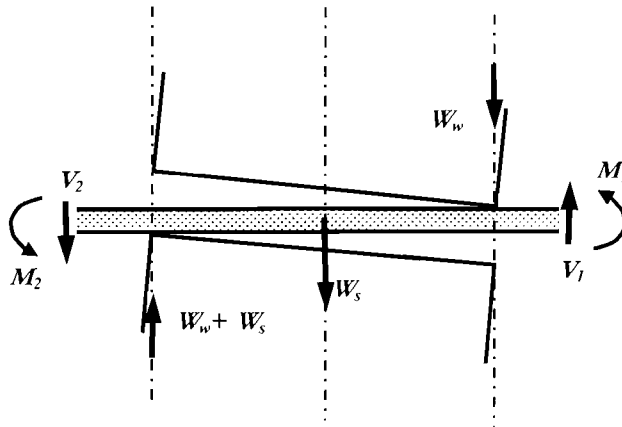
Equilibrium Conditions of a Coupling Beam Intersecting a Masonry Wall
